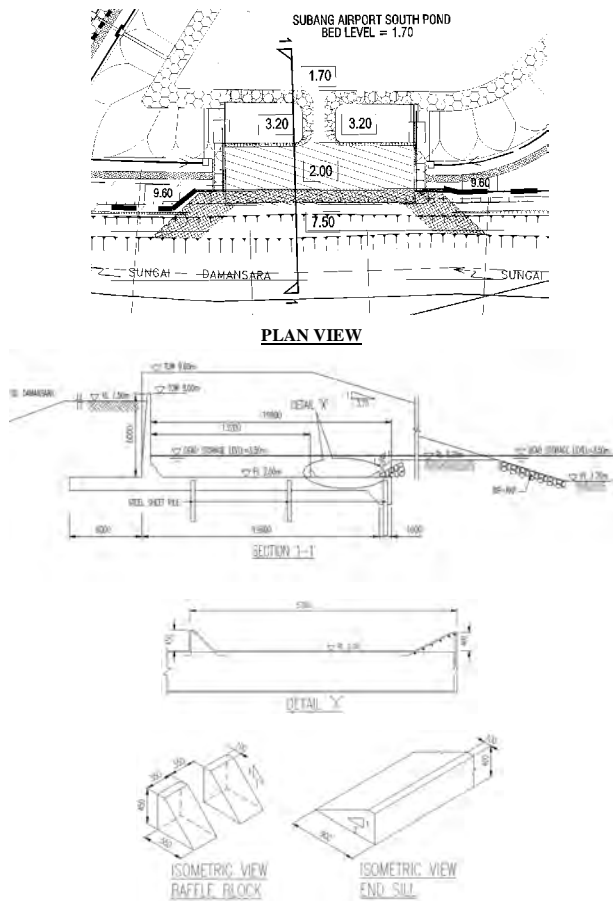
Layout, Section and Details of SAS Detention Pond Inlet Structure
